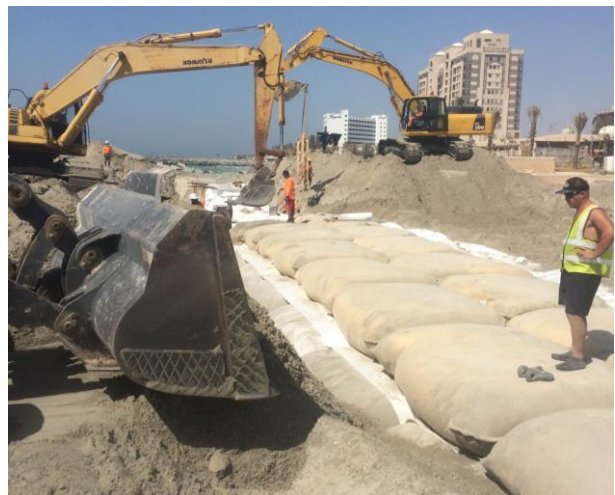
Placing 2.5m³ sand filled geotextile containers over Trapbag core
